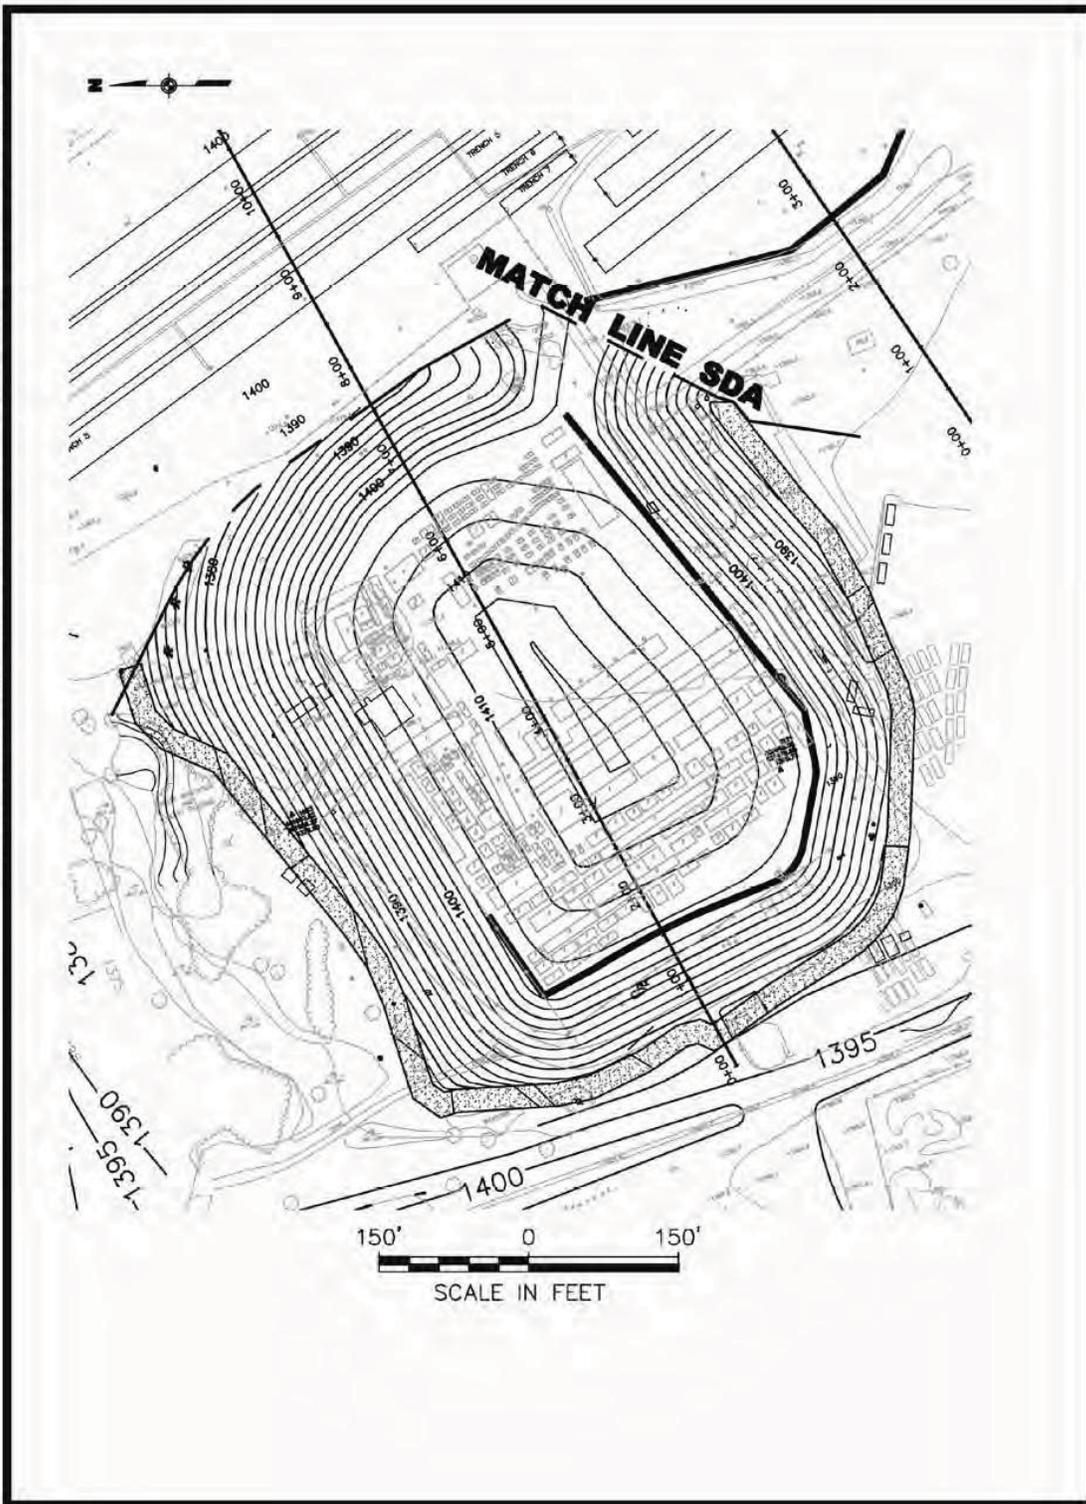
(Figure 2-27 from Sitewide report) WMA 7 Cap and Barrier Wall
